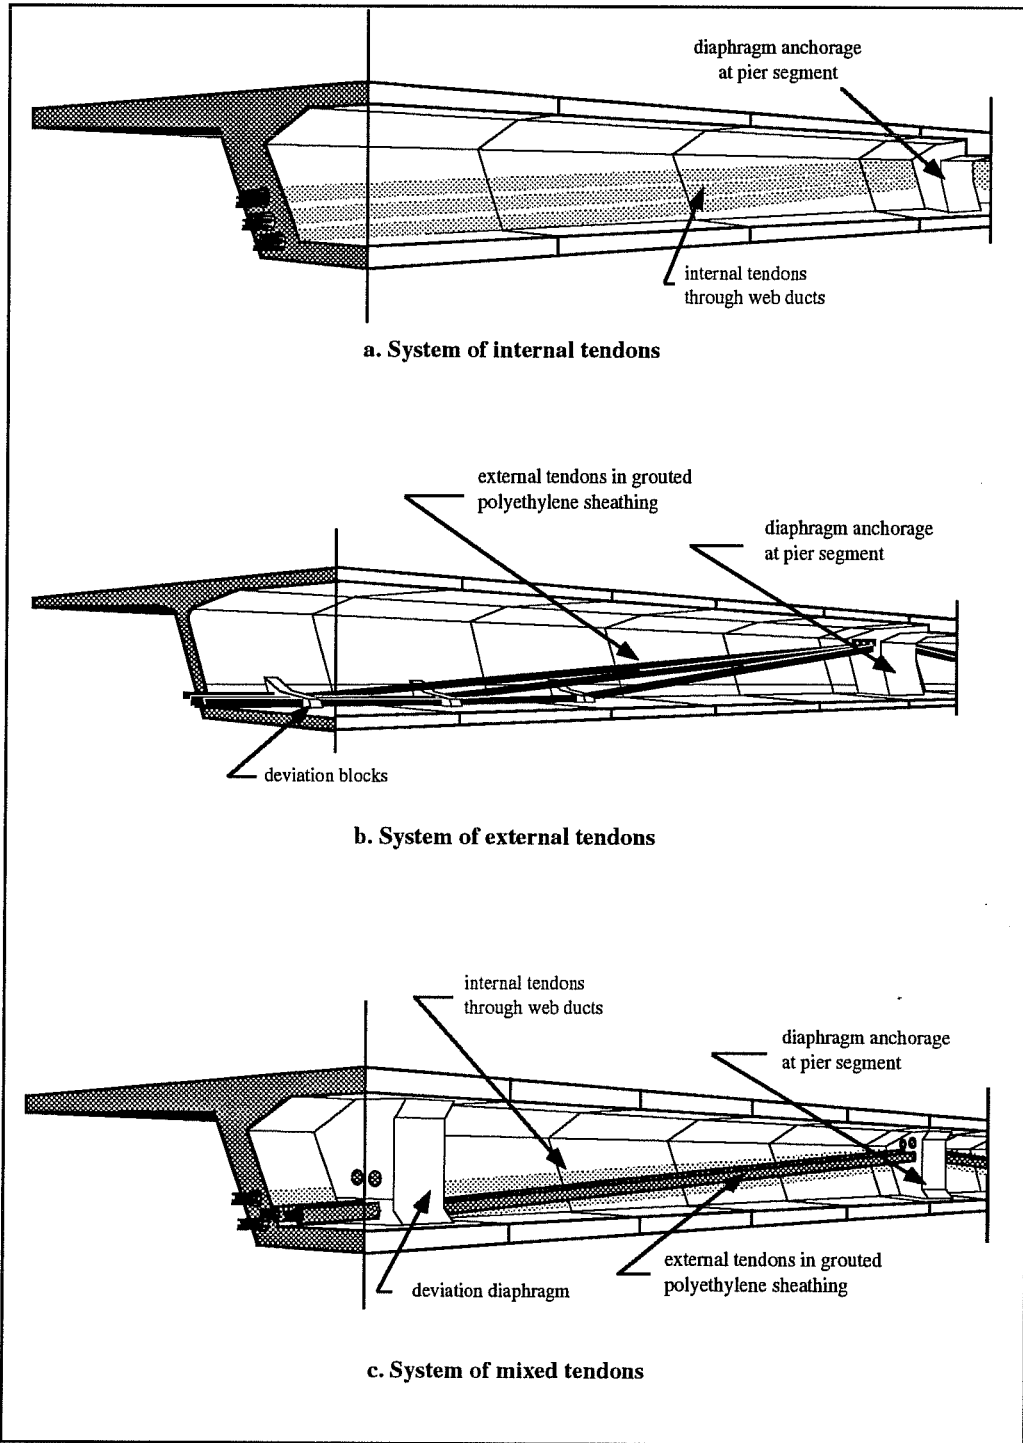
Classification of layouts of longitudinal prestressing tendons of box girder bridges.
